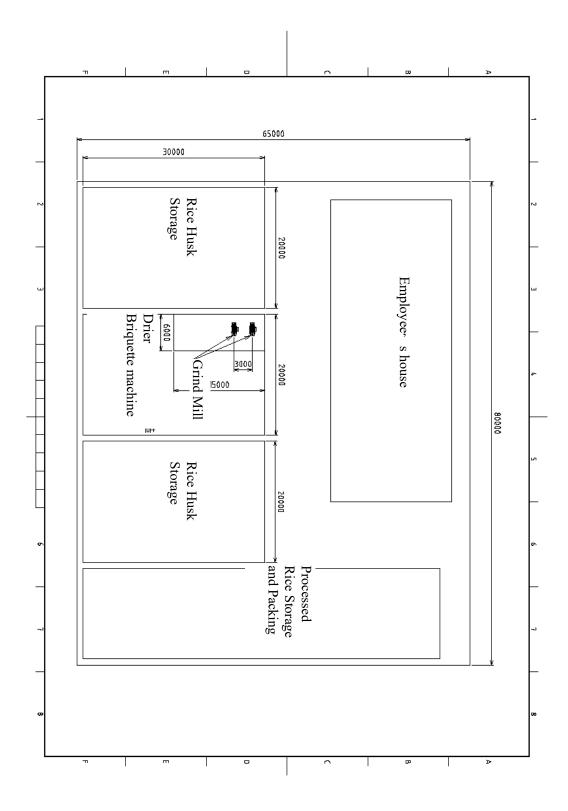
Proposed installation of Grind Mills (Chau Hung rice milling plant)
